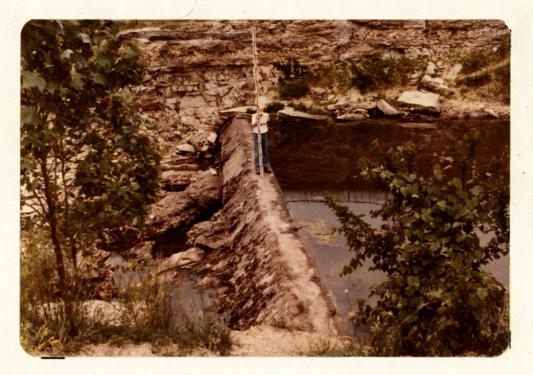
PRINCIPAL SPILLWAY CONCRETE SILL TAKEN FROM TOP OF DAM
